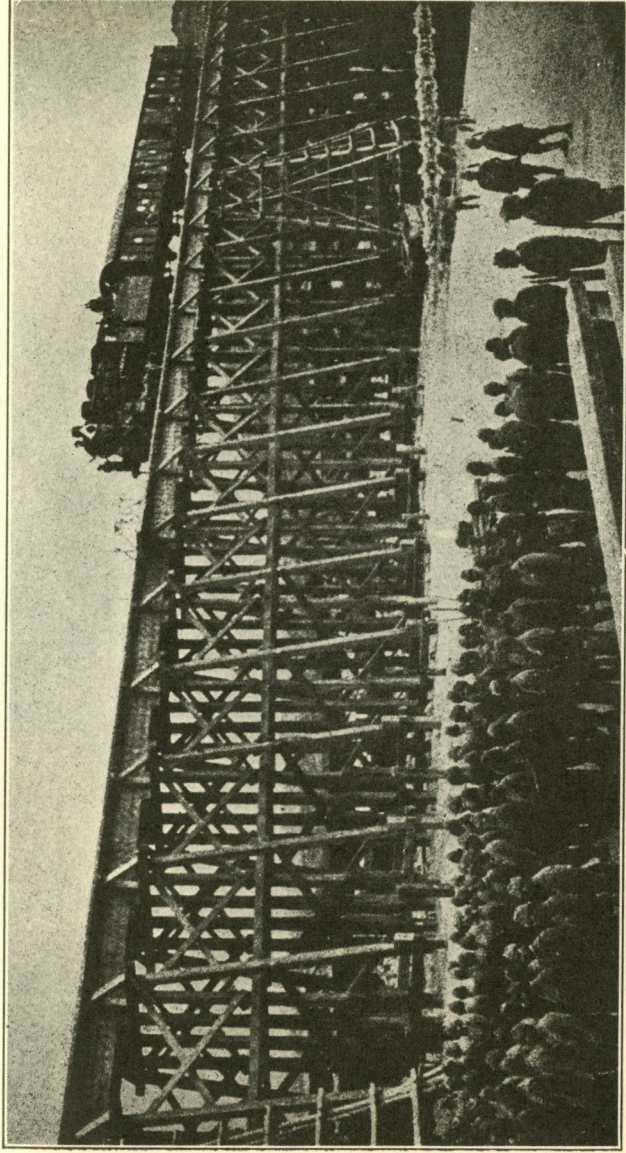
Bridge erected by Army Engineers to replace one destroyed. Japanese Engineers have displayed a high standard of skill in wooden bridge construction.
